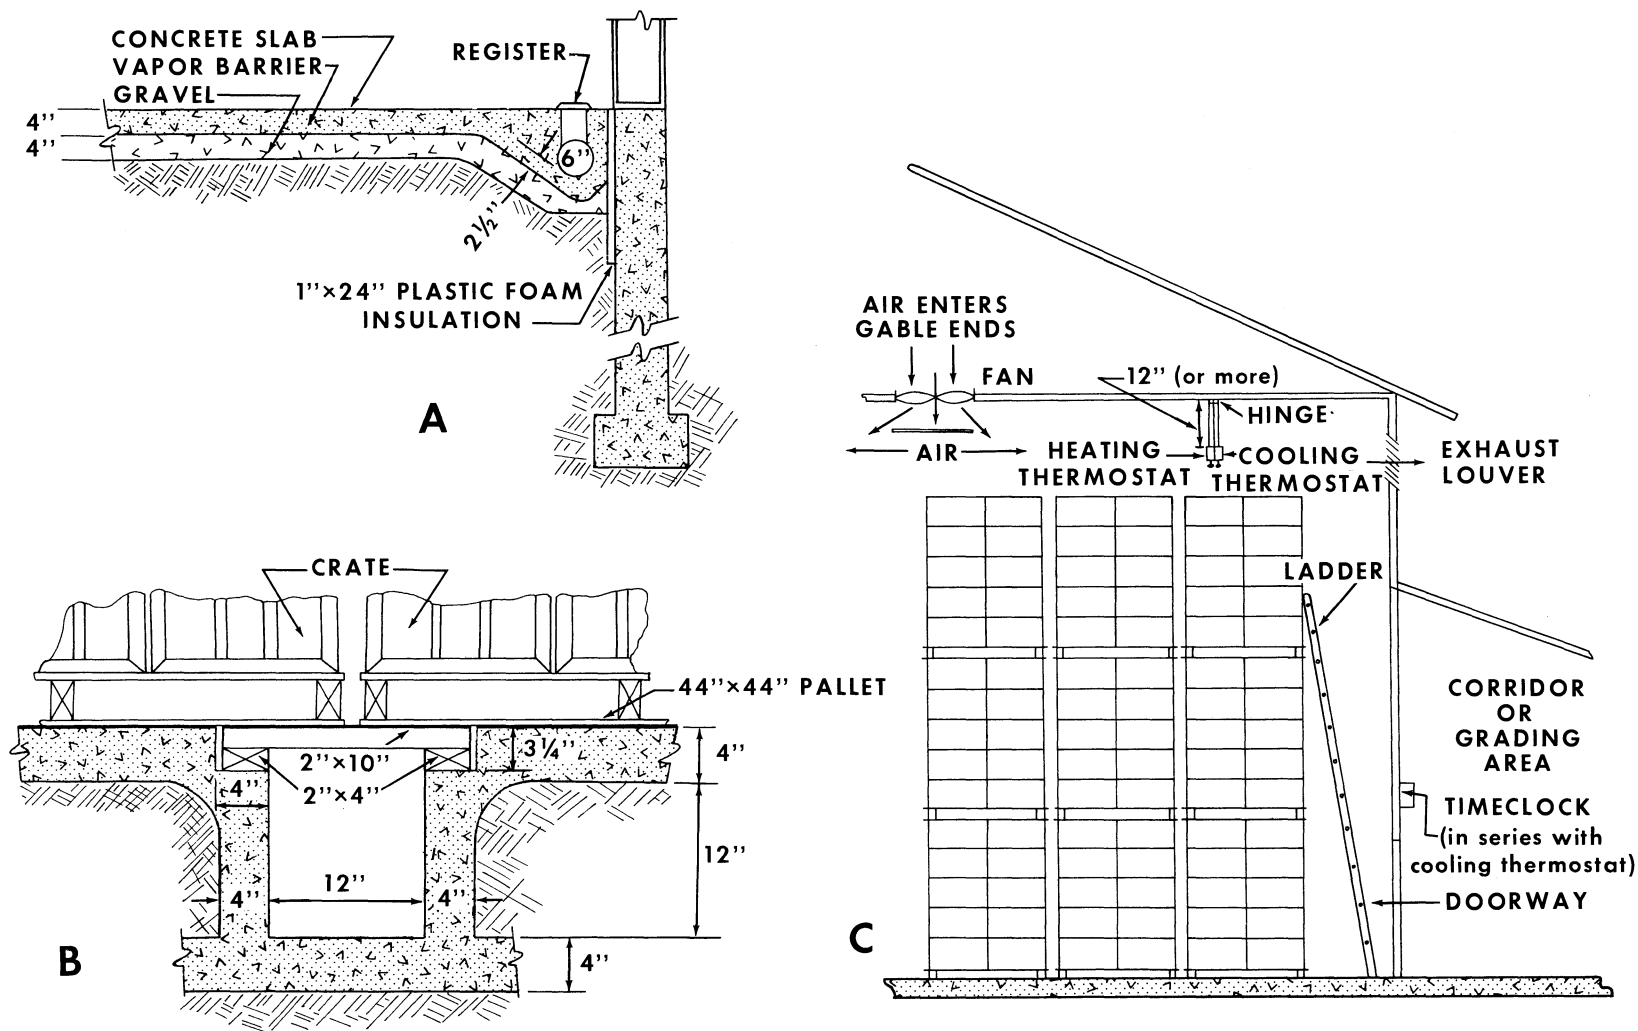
Suggested construction details for heating system: A, Location of ducts in concrete floor; B, trench detail; C, location of thermostat.
